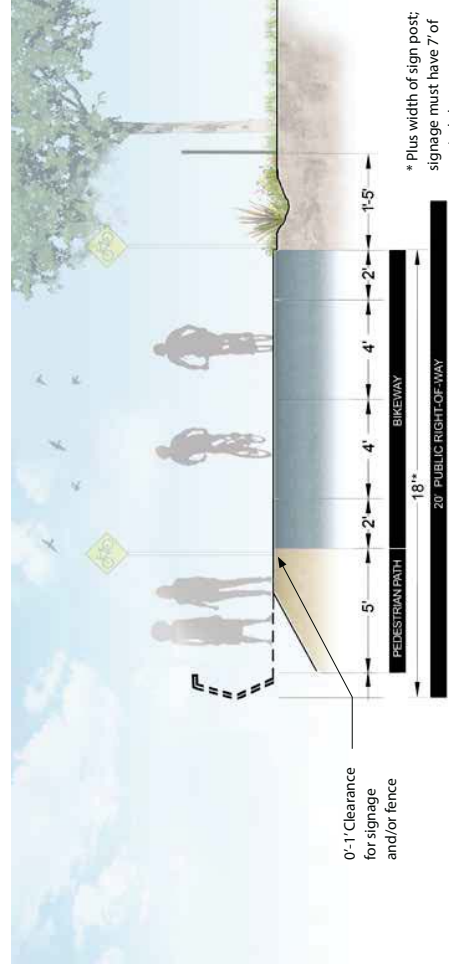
Lindley Avenue to White Oak Avenue - Typical Cross Section
